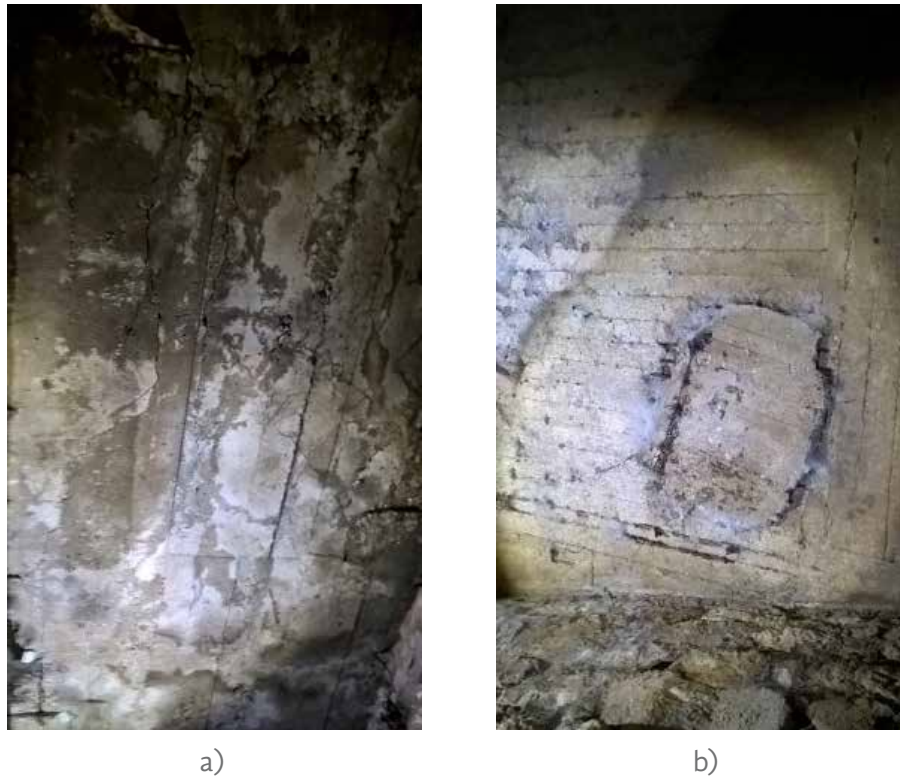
Material failures: (a). Cracking and (b). Slab bursting
